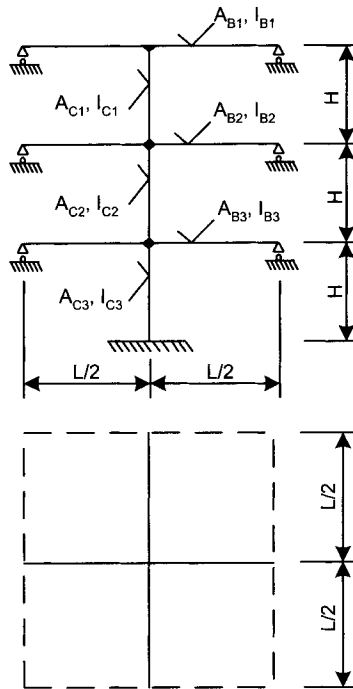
The investigated frame under horizontal loads consisting of a column and 4 beams in each storey. The frame is a central part of a building as it is seen in the top view
